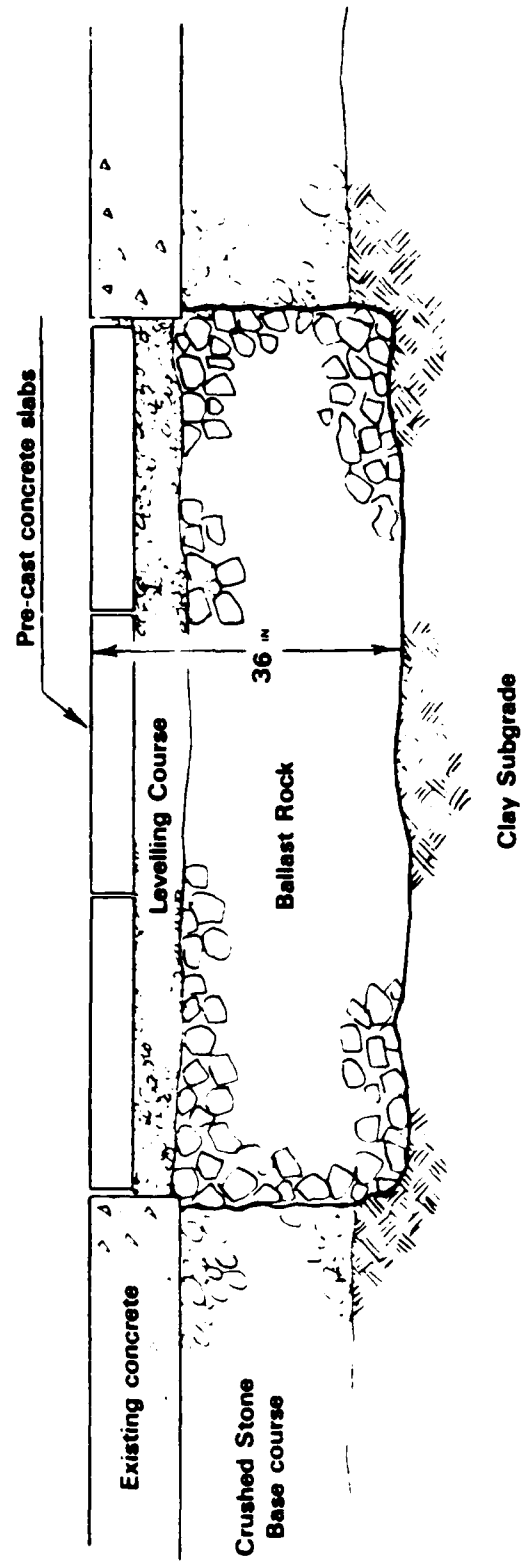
Cross Section of Preliminary Precast Slab Test (SKY TEN).
